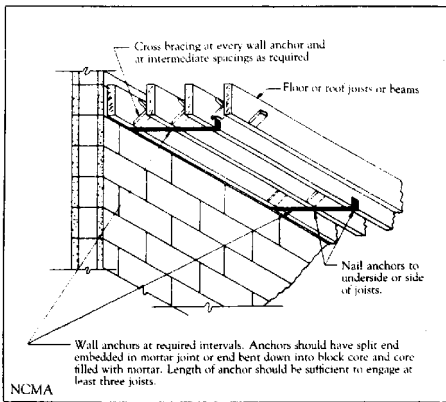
Joists parallel to a block wall should be anchored at a minimum of every eight feet. Anchors should engage at least three joists.
